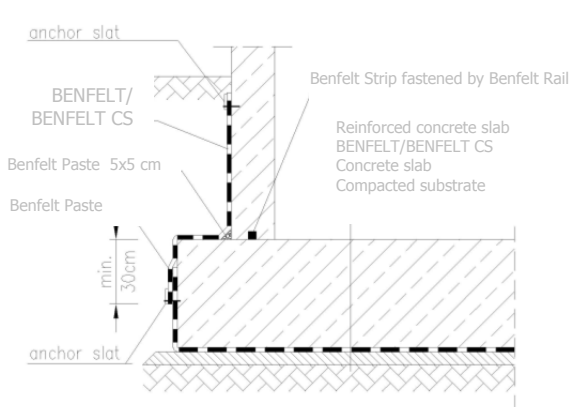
Passage of the horizontal insulation onto the foundation wall in case of a board with offset - Variant I.
